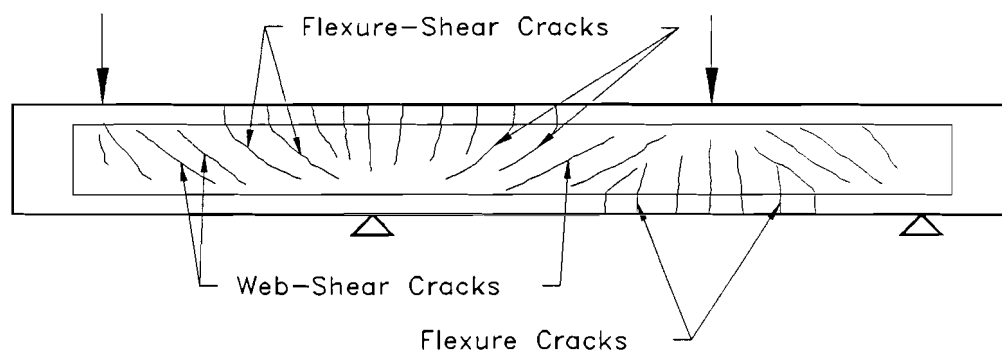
Types of cracking in reinforced and prestressed concrete beams.
